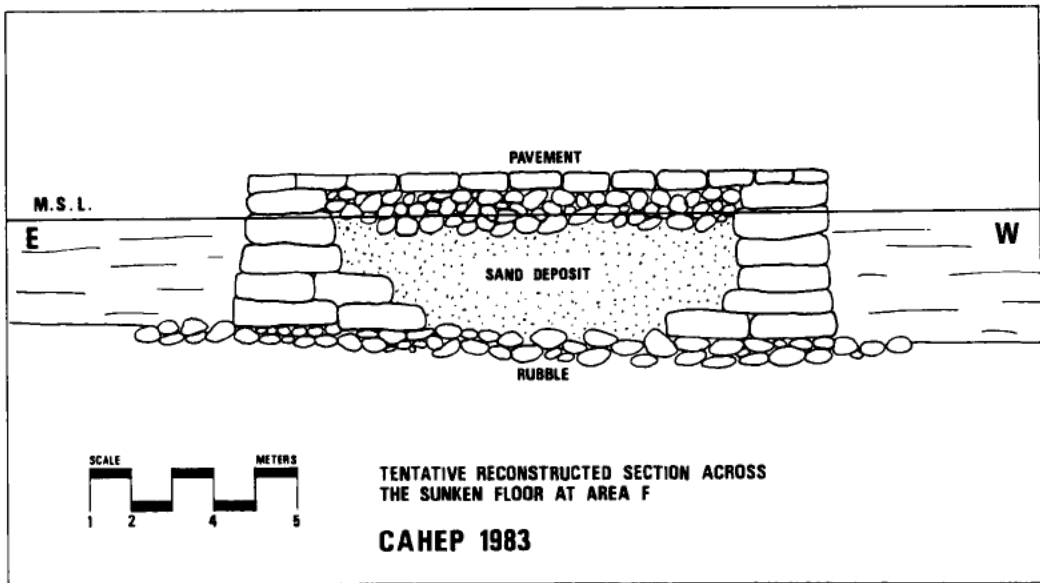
Tentative reconstructed E-W section of the sunken floor.
